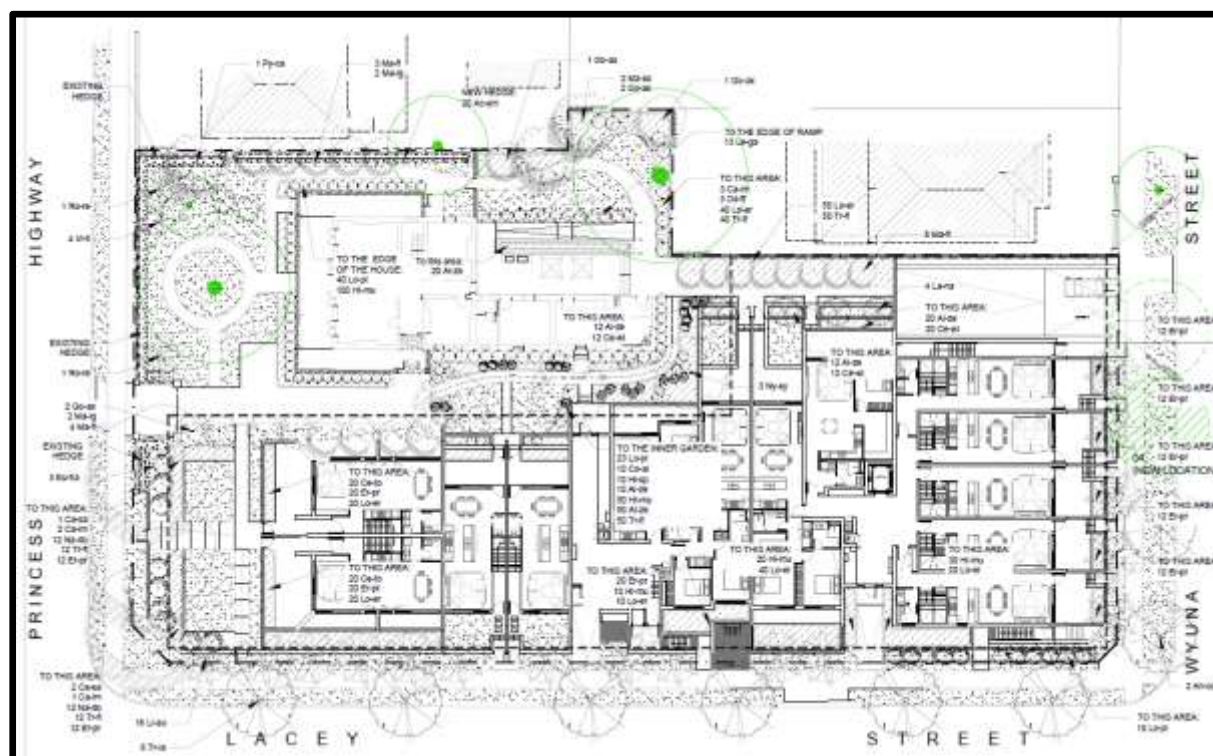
The proposed landscape plan showing the existing trees and new plantings which are focused around the periphery of the site (*courtesy TaylorBrammer, 2018*)
